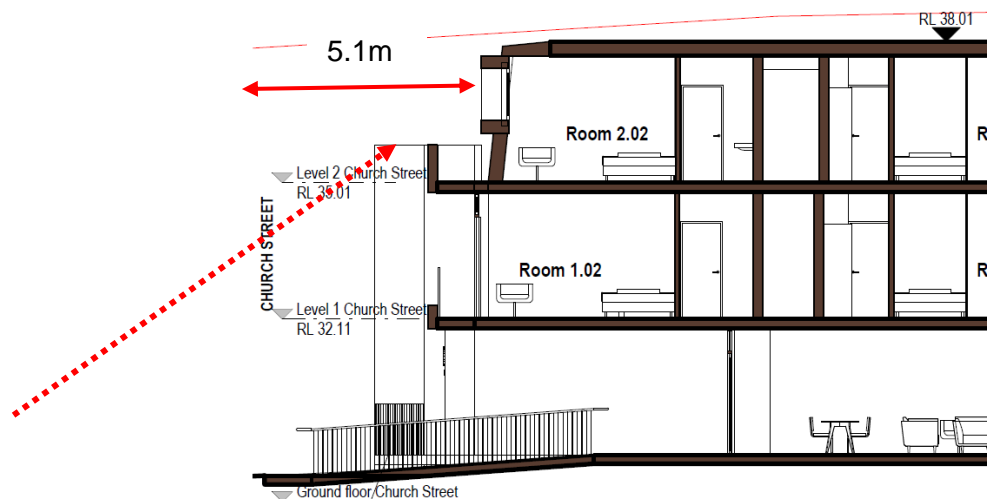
Illustrating site lines from Church Street and the 5.1m setback of the third floor
